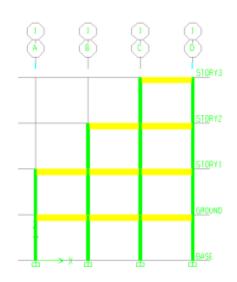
Elevation of setback building for three storey model (00 slopes)
